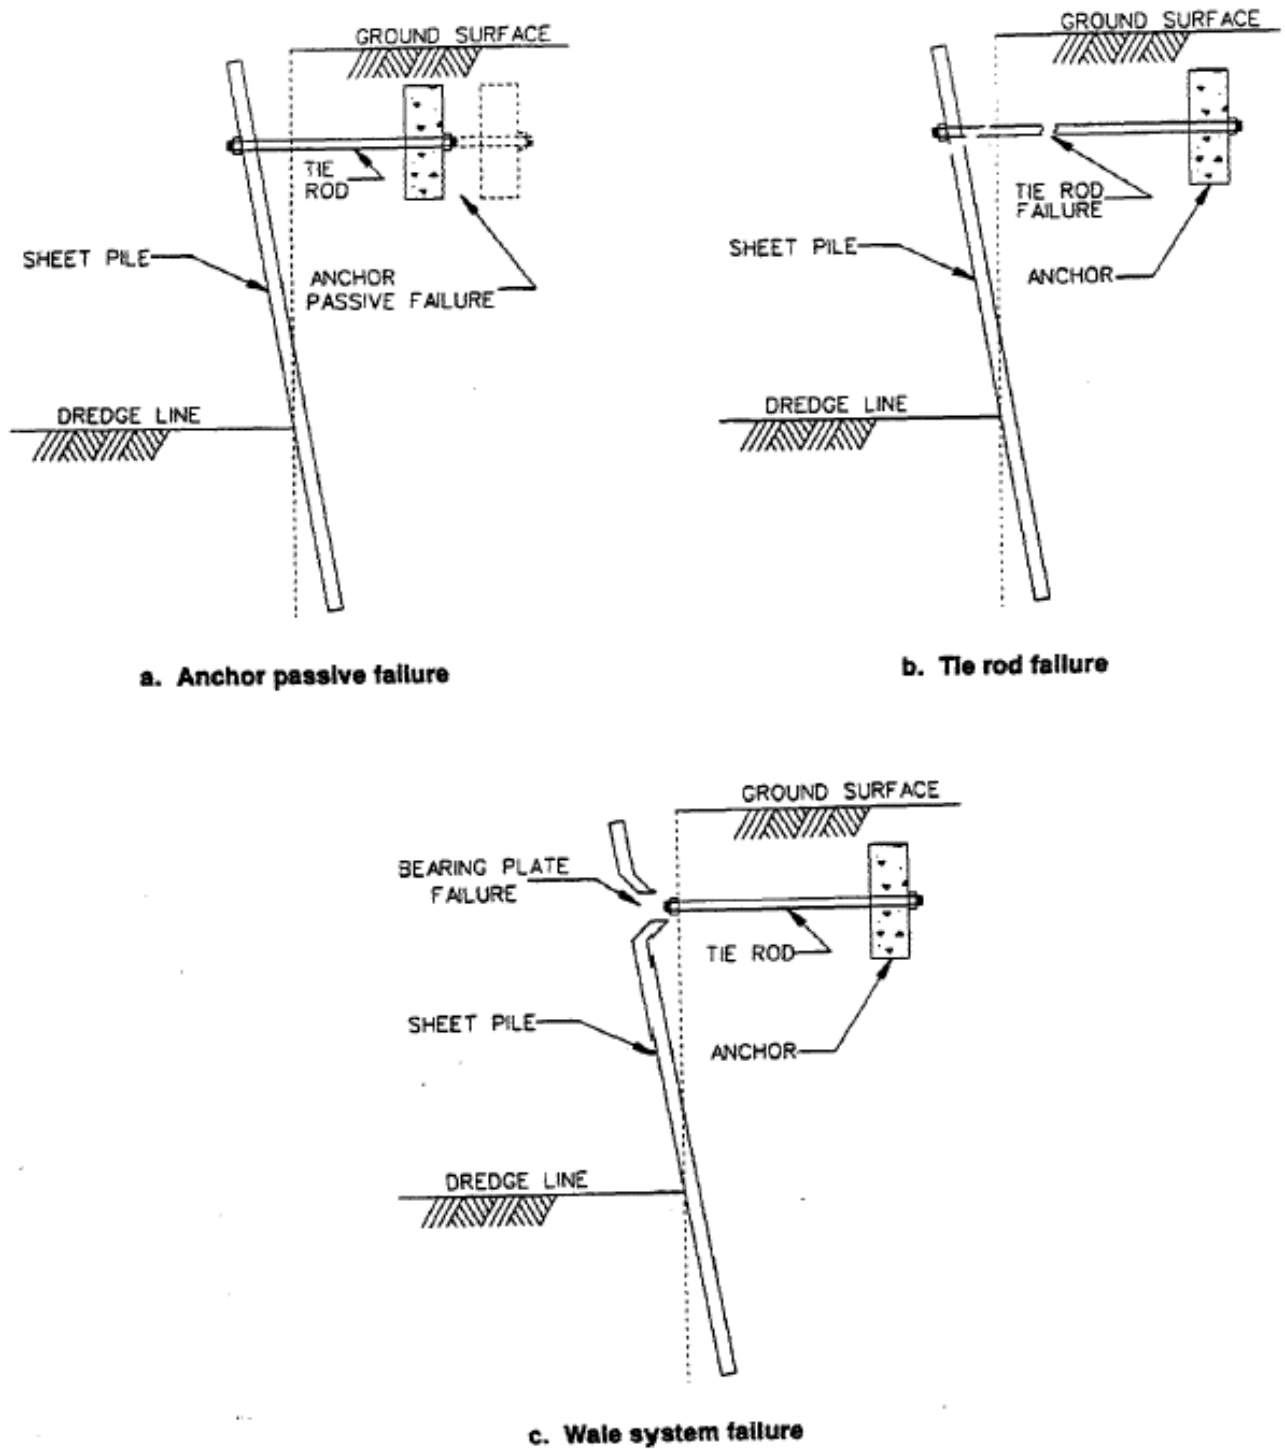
Anchorage failure of sheet pile wall (website of Hercules Machinery Corporation)
